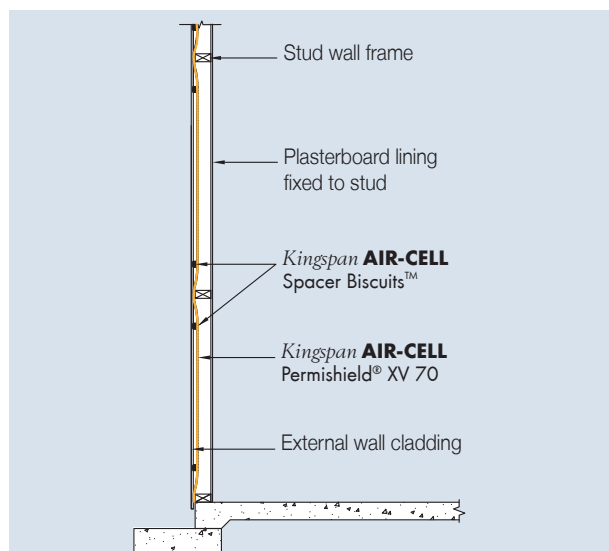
Side elevation of Kingspan AIR-CELL Permishield® XV 70 on steel-framed wall
